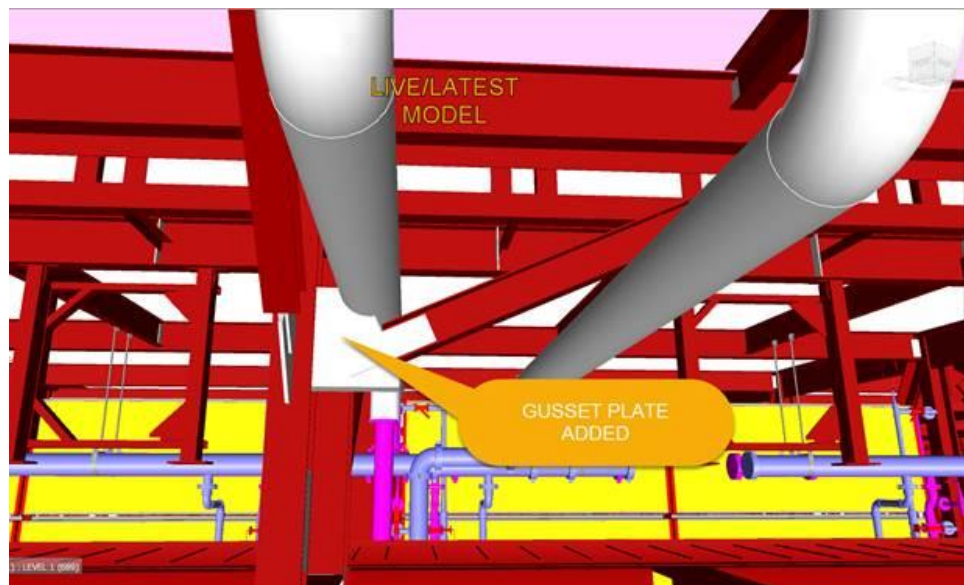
A structural model including the connection details (gusset plate) and it is clashing with the plumbing pipe.
